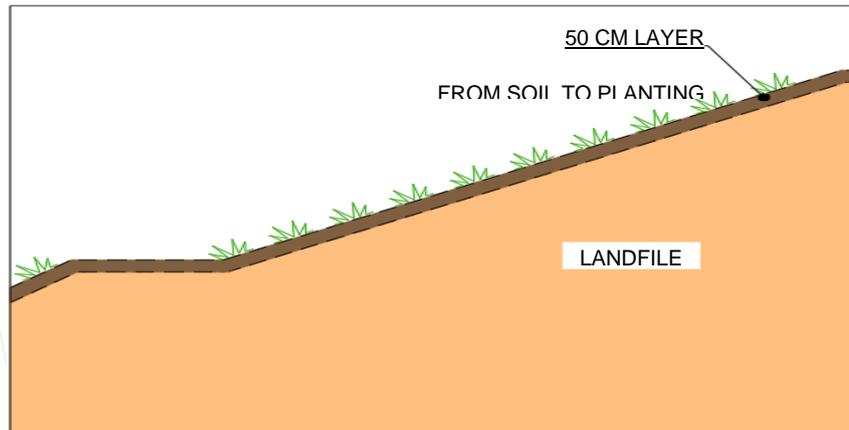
Typical section waste stockpile (GHT, 2022)
